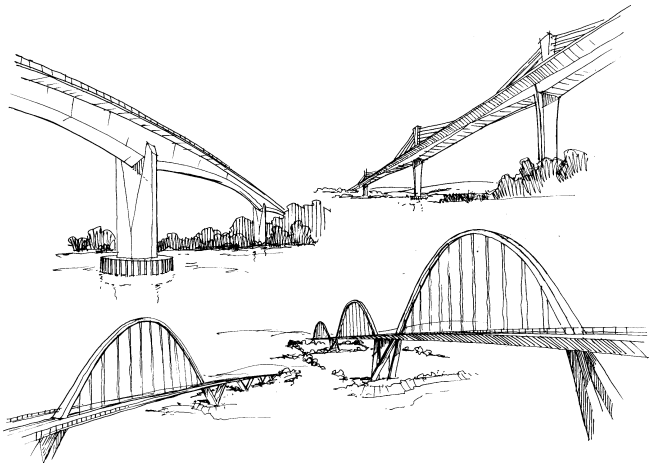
Four bridge options were developed for detail investigation. A. Haunched Box Girder; B. Three Arch Bridge; C. Single Arch Bridge; and D. Three Towered Extrados Bridge. Yee Associates.
